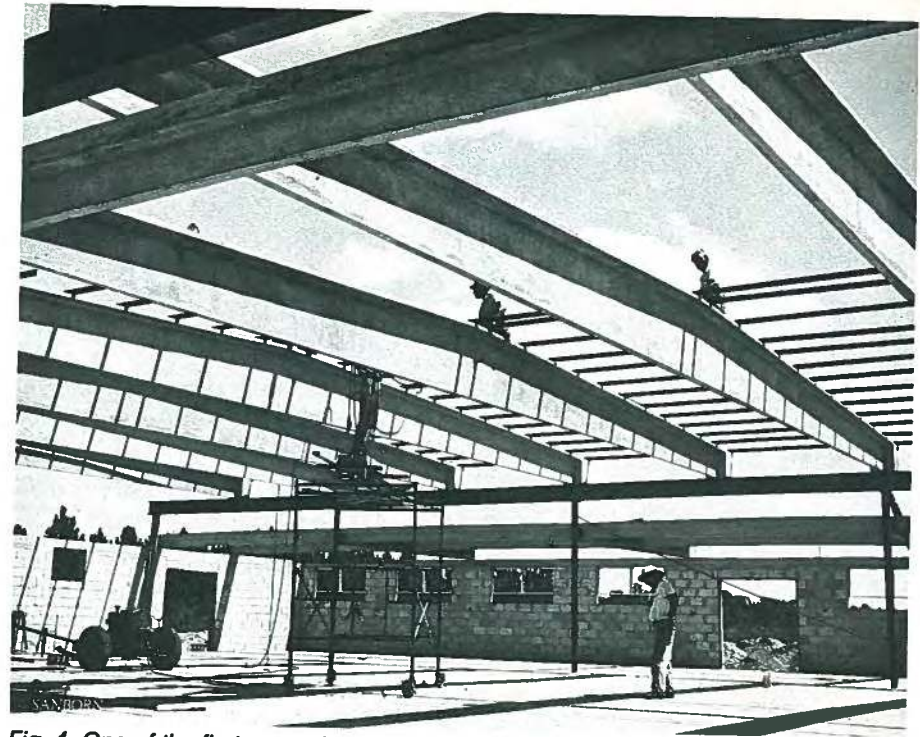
One of the first examples of pretensioned tapered beams built in Florida in the mid-fifties. These 60-ft (18.3 m) beams were fabricated by Prestressed Concrete Inc., in Lakeland.
